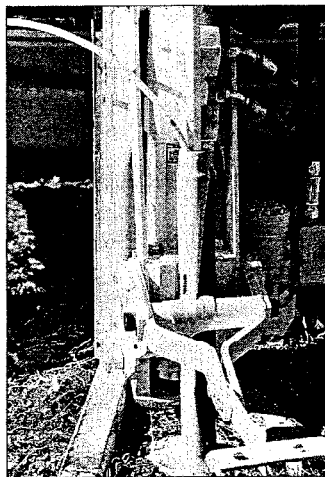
A grout machine and flexible tubing allow bottom-up grouting as the outer casing is retrieved.
